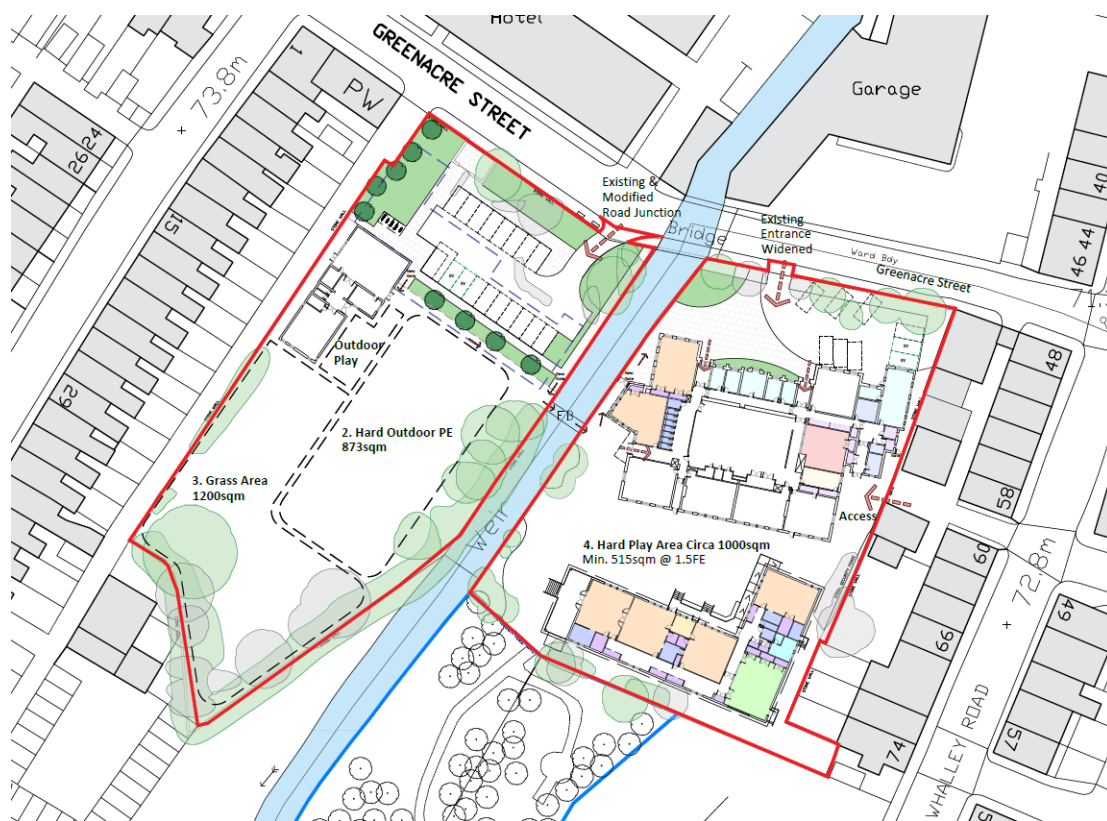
Proposed Site Plan [dwg ref. 10512-P01]
